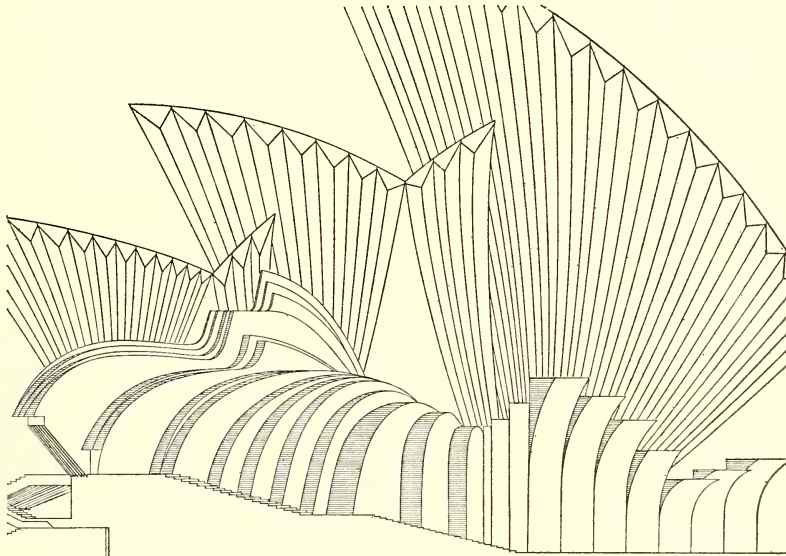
Second design of Minor Hall. Longitudinal section (showing interior elevation).
